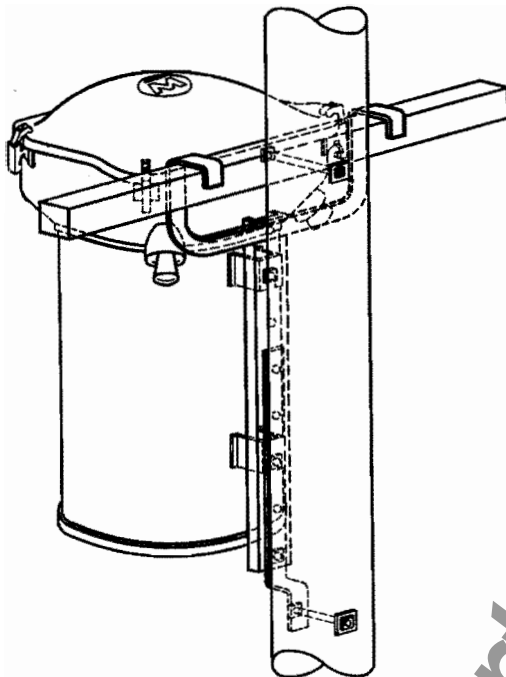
TRANSFORMER MOUNTING USING "KICKER" TO REPLACE LOWER CROSSARM.
